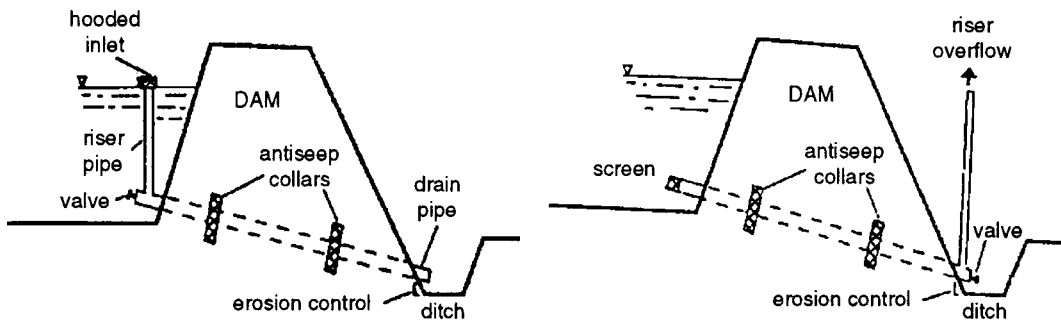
Cross section of dam showing two types of drain commonly used: hooded inlet pipe (left) and outside drain valve (right). Also note use of antiseep collars.
